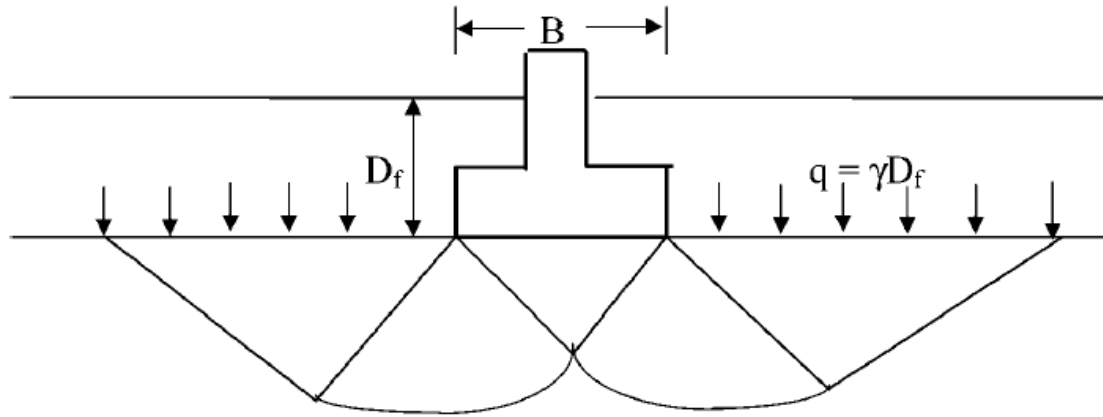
Bearing capacity failure mechanism in soil under a rough rigid continuous foundation subjected to vertical central load proposed by Terzaghi (1943)
